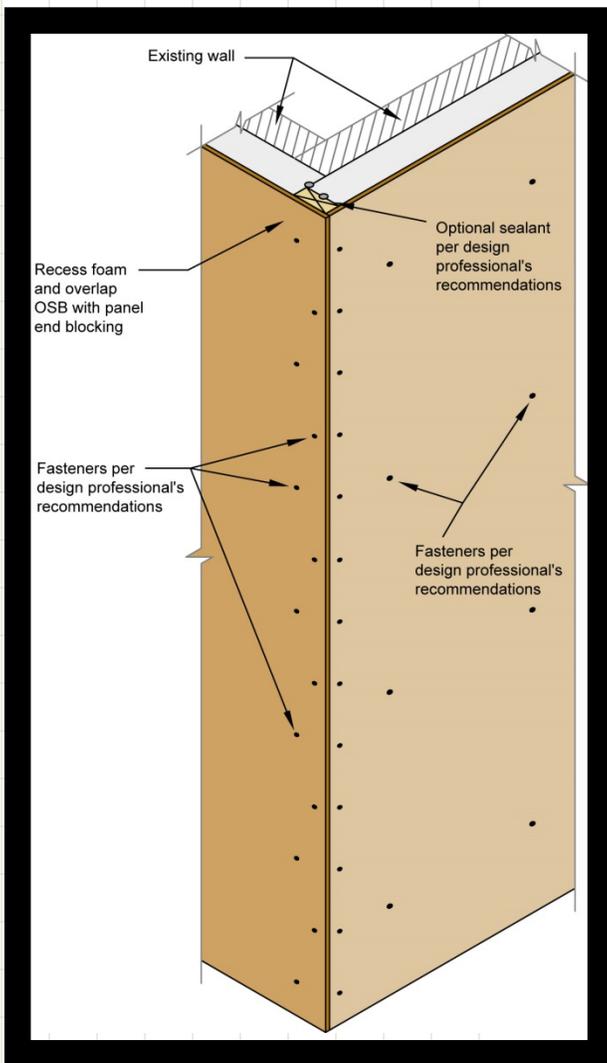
Retrofit Insulated Panel Installation Detail at Outside Corner
